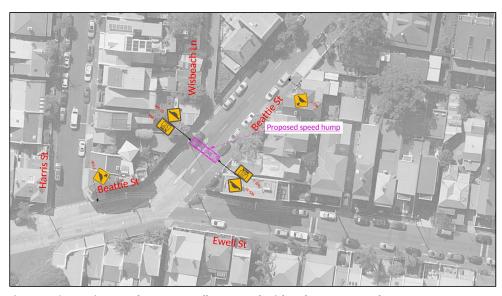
Beattie Street between Ewell Street and Wisbeach Lane proposal.
